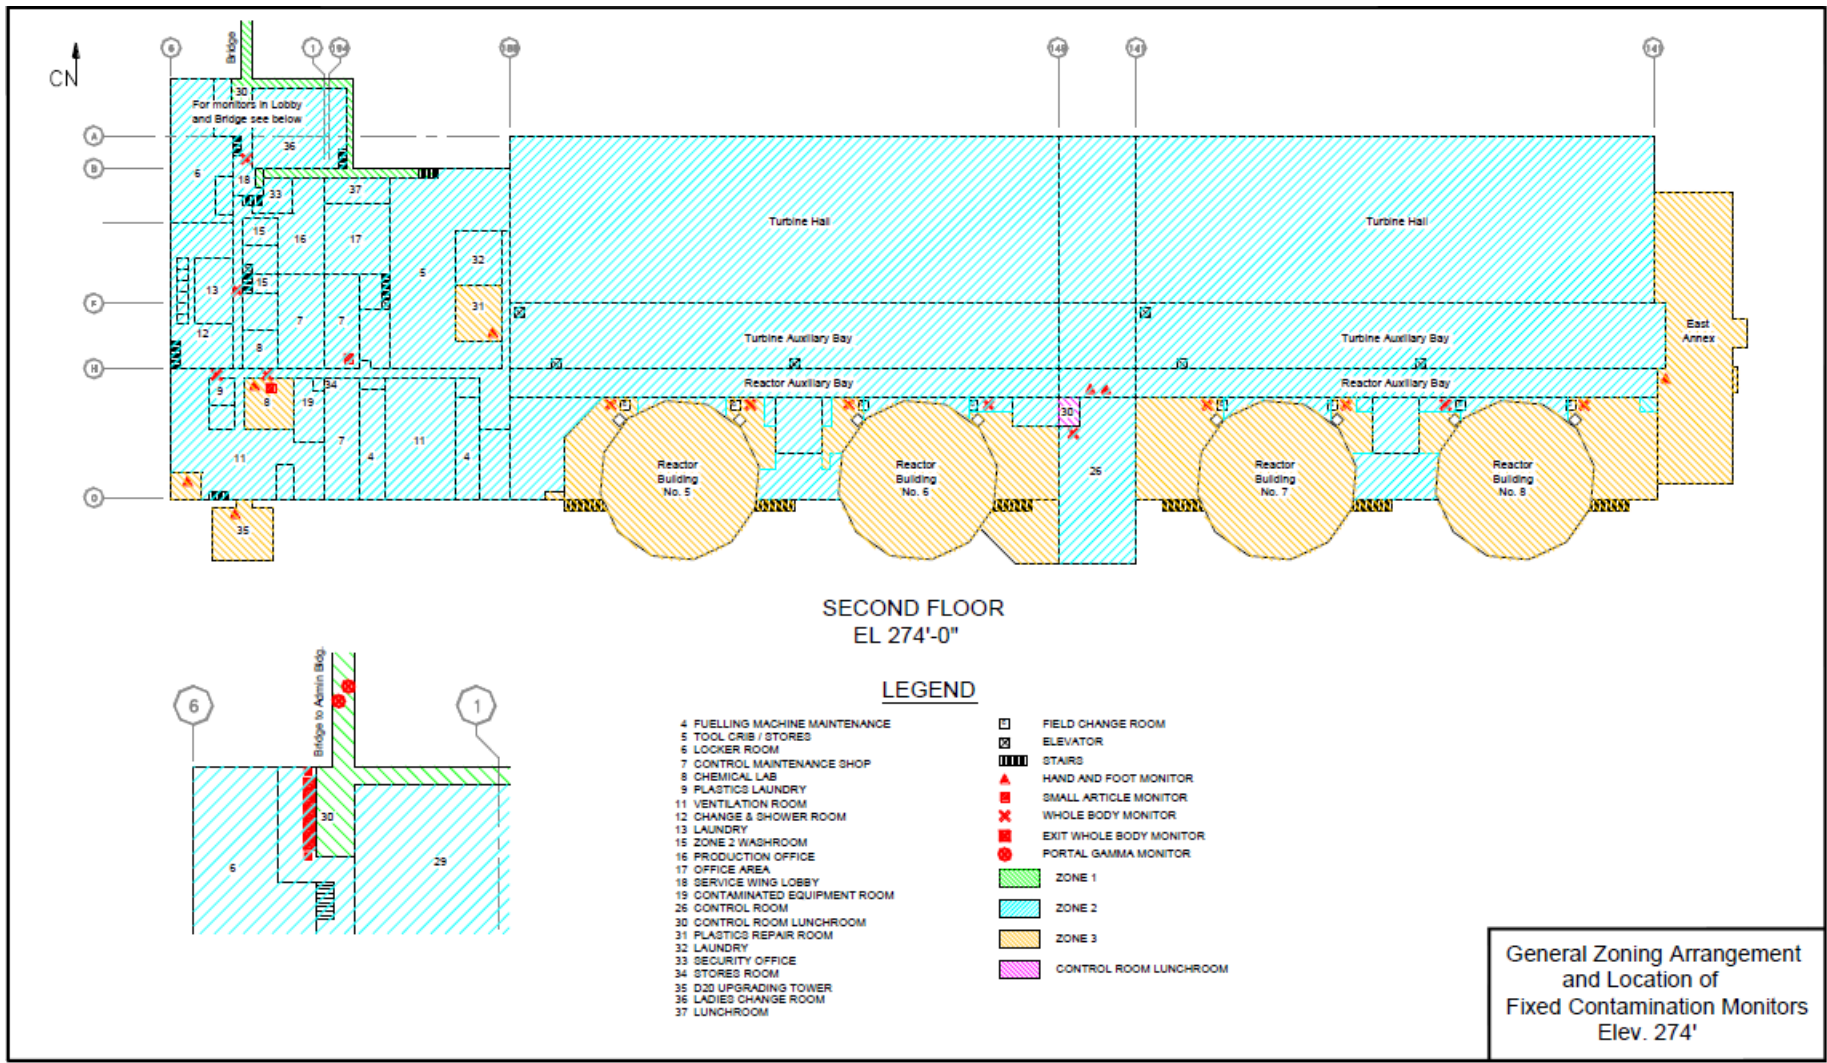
Pickering 5-8 274' Elevation Zoning Arrangement
